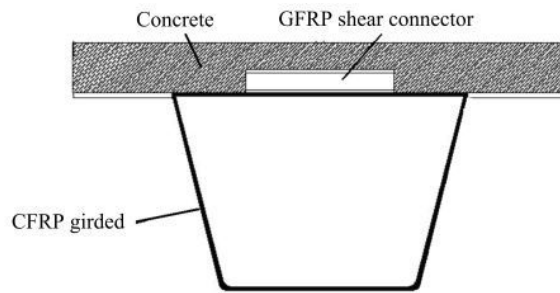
Cross-section of the hybrid beams used in the Asturias bridge (adapted from [55]).
